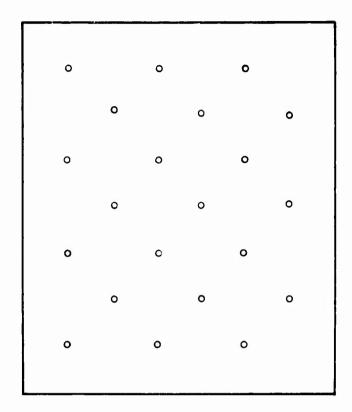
Improved Lacing Pattern. An improved lacing pattern for reinforcing steel. It is possible to use the same amount of steel and obtain the same structural properties as with a cubic lattice, while reducing cracking along preferential planes, by offsetting alternate rows by one-half of a lattice spacing. This should be done in both vertical and horizontal planes.
